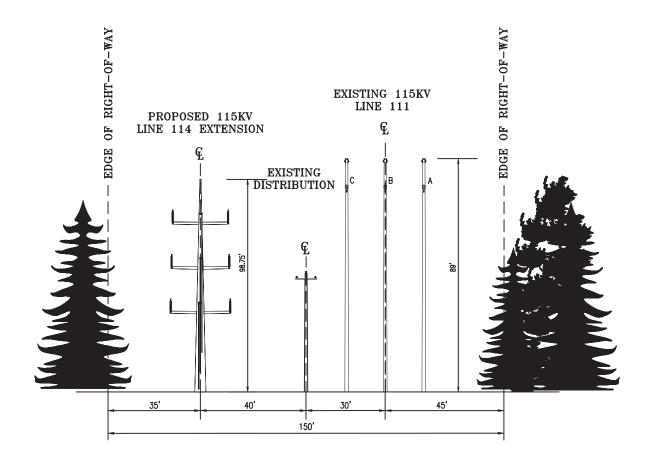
Typical ROW Cross-Sections / Plan & Profile Drawings
